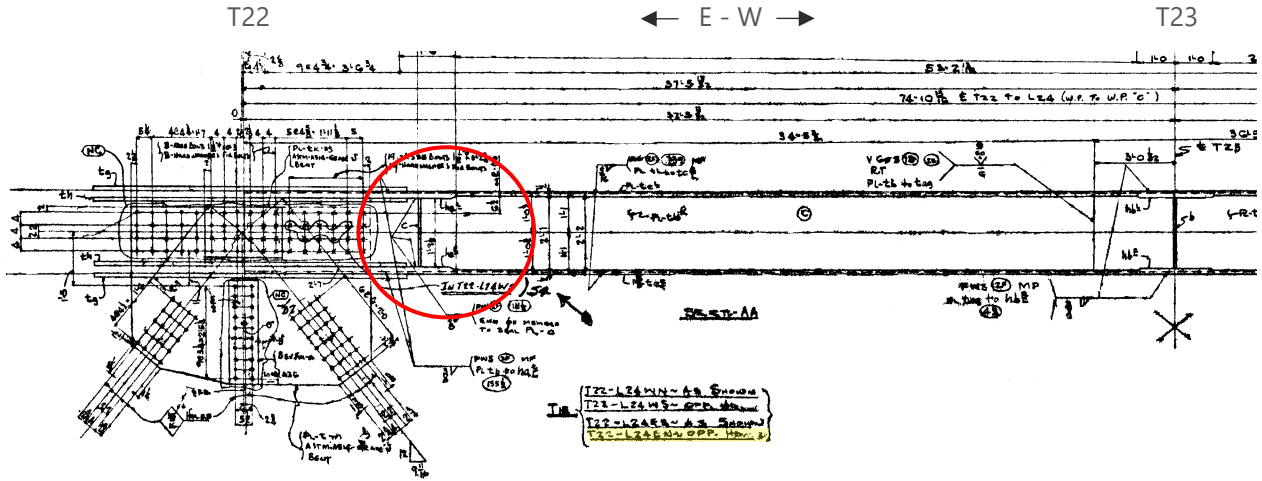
Shop drawing (longitudinal section view shown opposite hand) for tie at location of fracture (circled).
